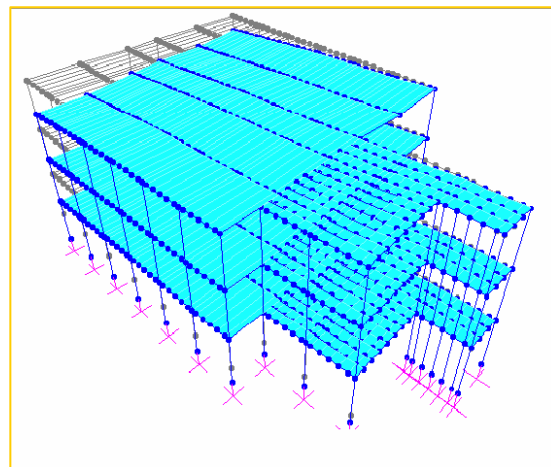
Deformed shape due to (DLLLST) loading case (the assumed settlements).
